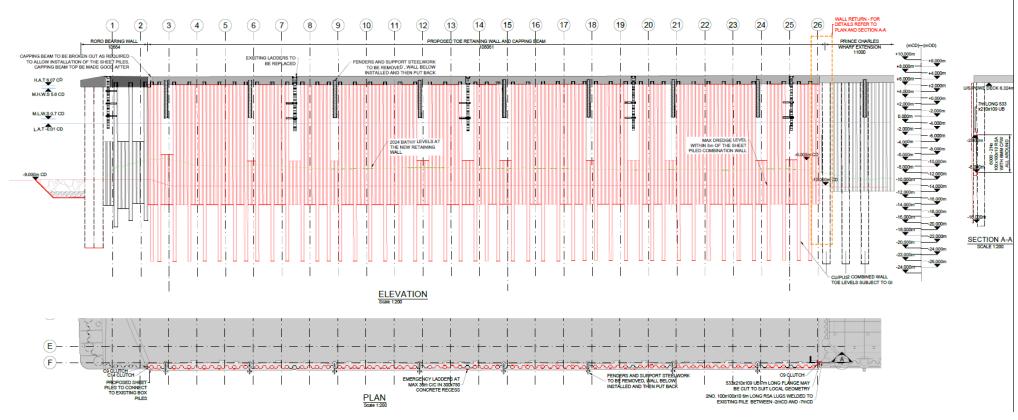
Improvement works to the PCW, elevation (top) and plan view (bottom) (proposed works are shown in red)
